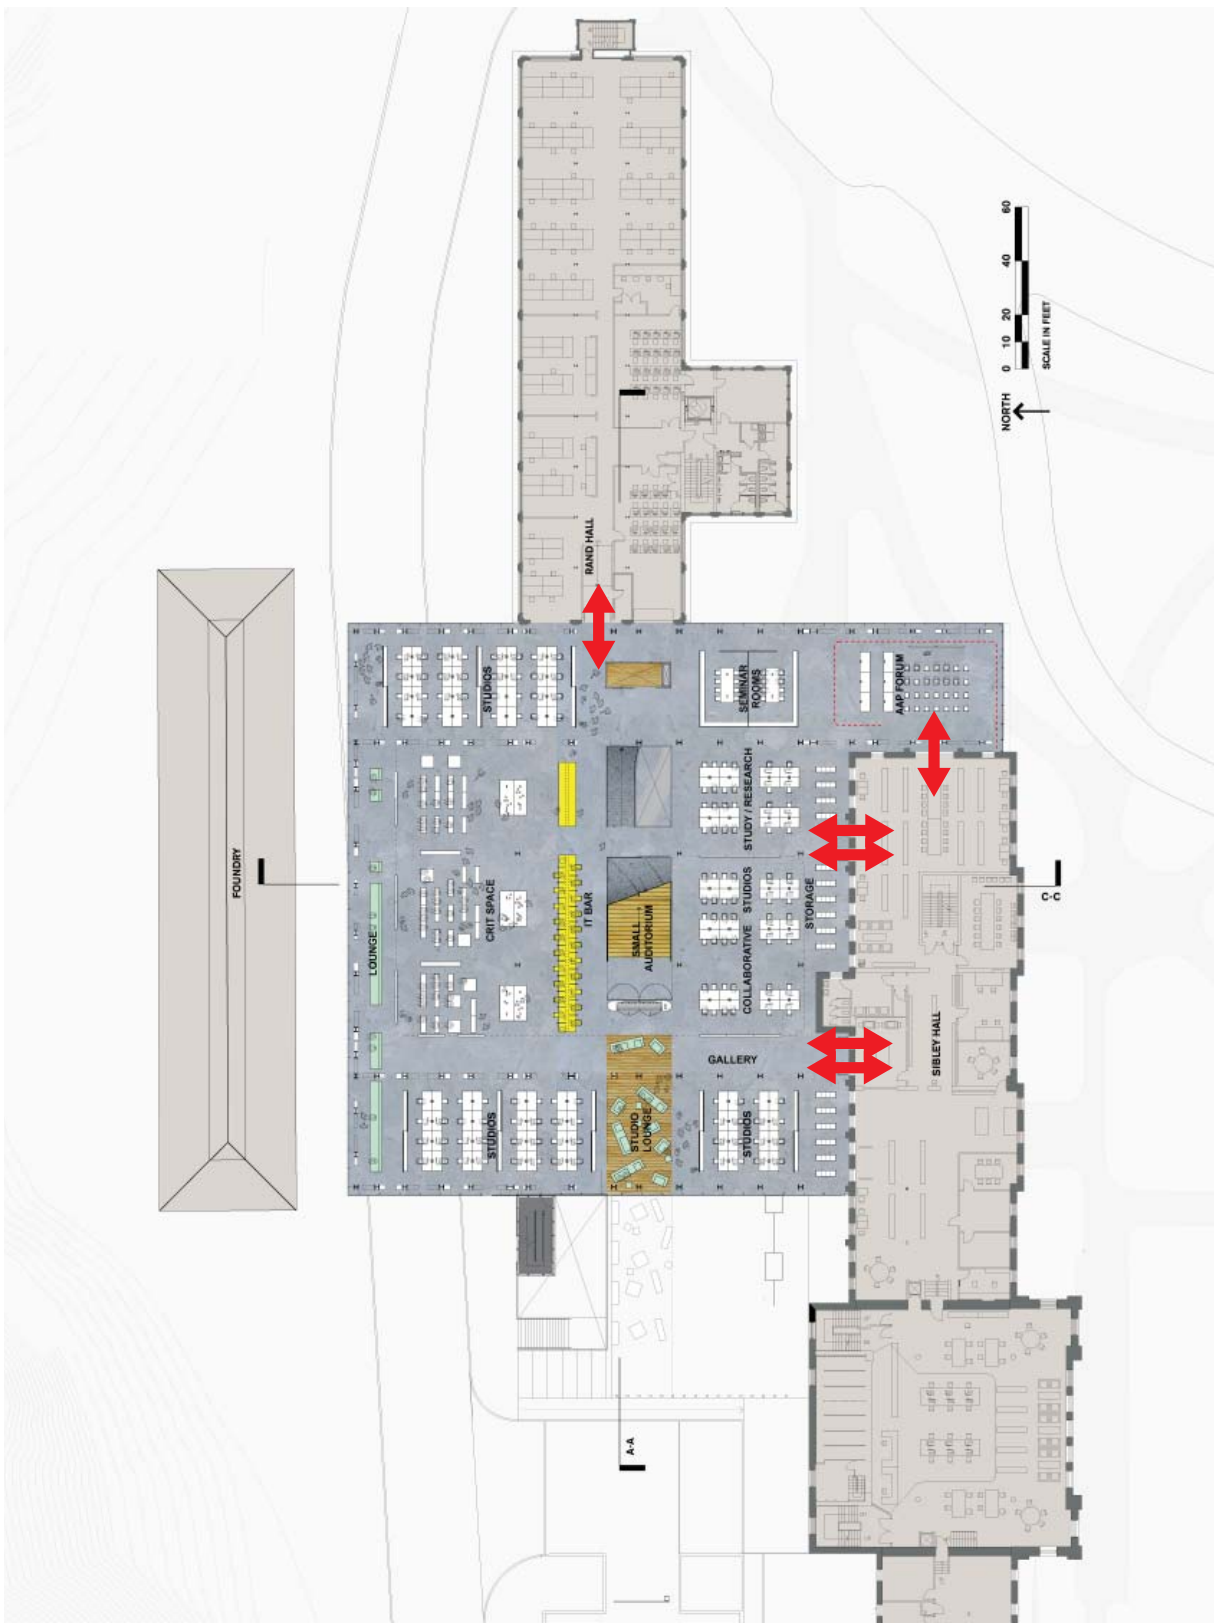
e: Upper Plate/Second Floor Plan: Milstein, Sibley, Rand, and CAPG. Red arrows indicate building connections.
